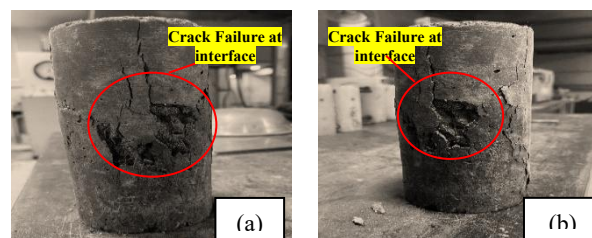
(a) Cone-type fracture and (b) Shear-type fracture
